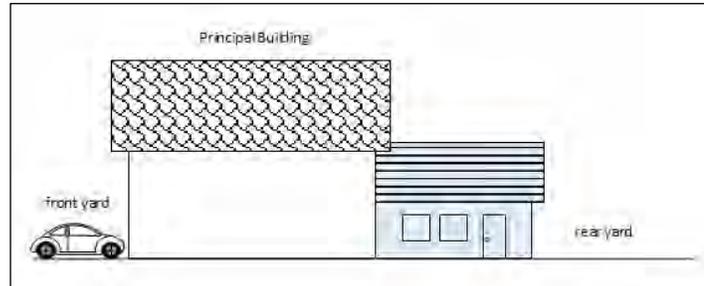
ACCESSORY DWELLING UNIT ATTACHED TO A PRINCIPAL BUILDING.
